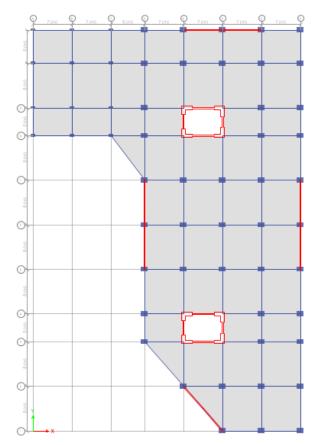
Typical Floor Plan: from base to 12 story level : Shear wall At middle portion
